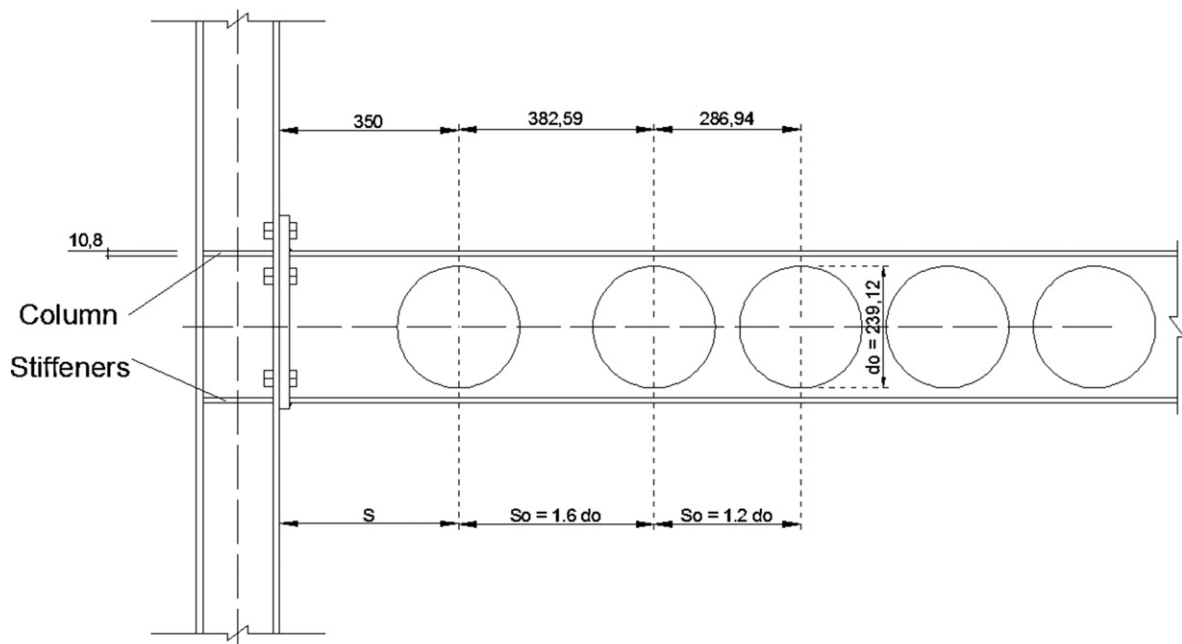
Geometrical parameters of connection Model 8 (in mm).
